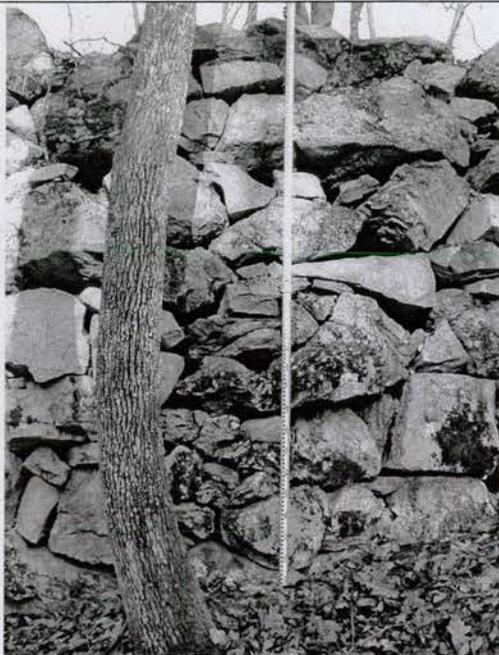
9-12-1-2005 London Bridge E wall, North to South, Section 6B View W
